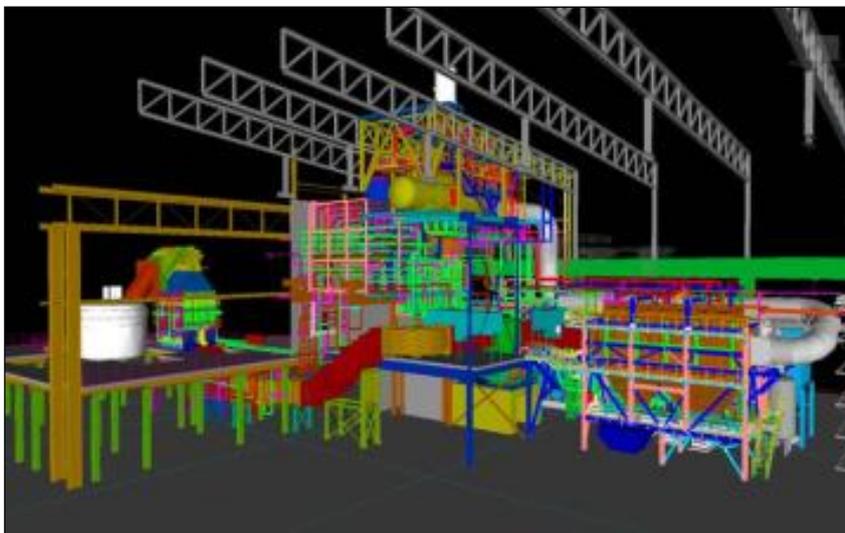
Waste heat steam generator rendering and installed equipment at ESF plant, Riesa
